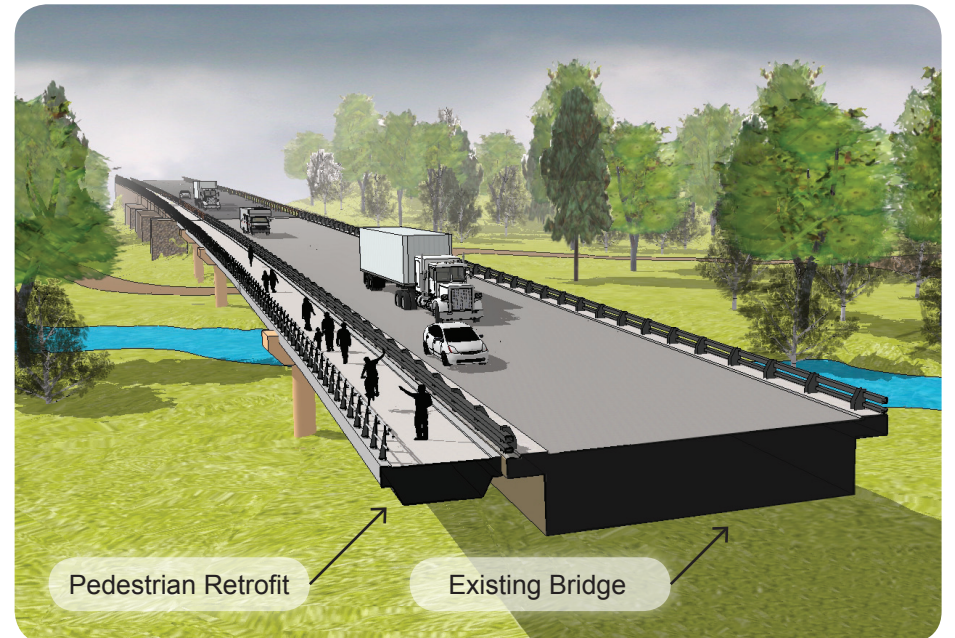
View of the attached pedestrian retrofit showing a cross-section of the structures. Additional footings and piers can be seen in the background.
